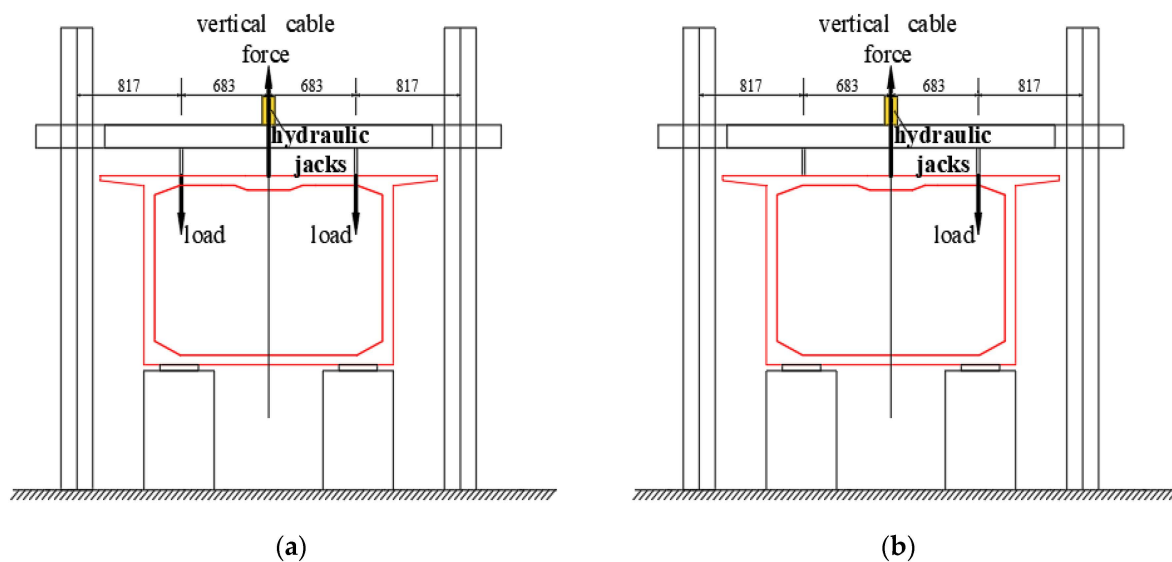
Schematic diagram of loading points under working conditions: cross-sectional view (a) symmetrical load; (b) unsymmetrical load (unit: mm).
